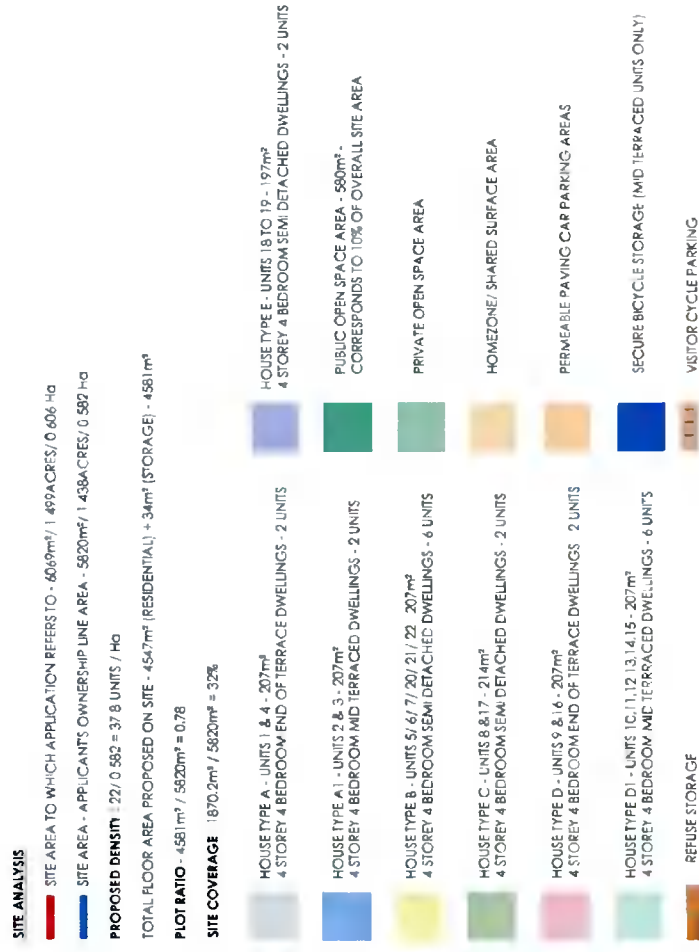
D-122-PL-SL-102 – Proposed Site Layout legend - Drawing produced by bba architecture
